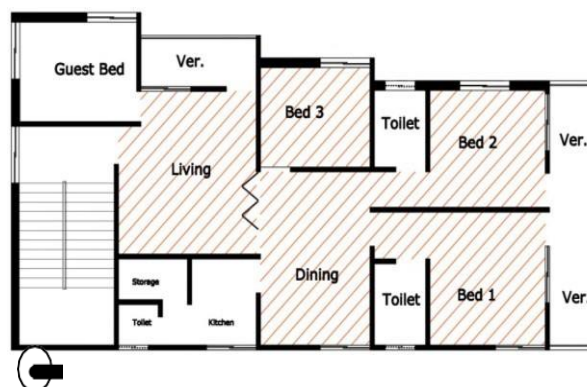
Study area (2<sup>nd</sup> Floor Plan) details of study
